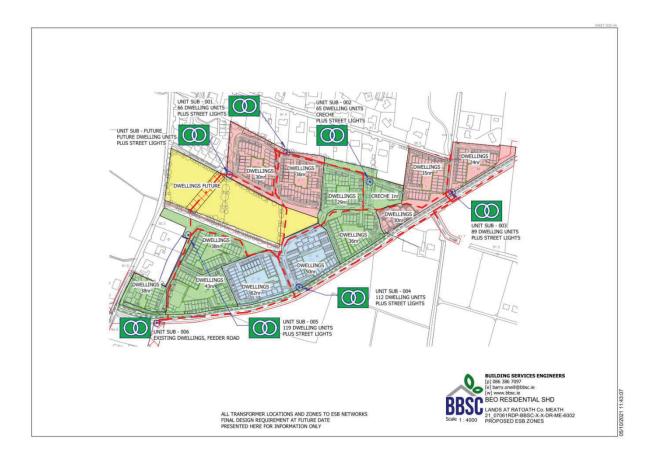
Proposed Site Electrical Sub Station from BBSC report "UTILITY IMPACT ASSESSMENT
